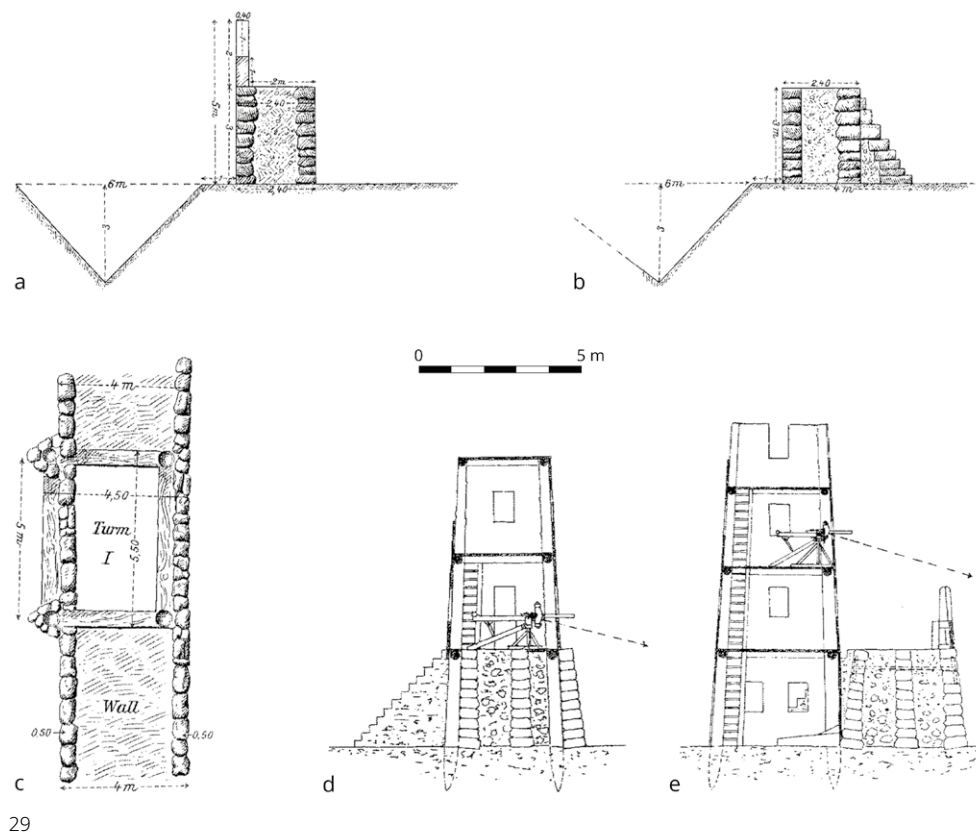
Schramm's reconstructions of the circumvallation structures: a. Section through the rampart and ditch according to Appian. – b. Section through the rampart and ditch, according to the archaeology found by Schulten. – c. Generalised plan of a tower within a rampart. – d. Section through a tower constructed within a rampart. – e. Section through a tower placed against the back of a rampart.
